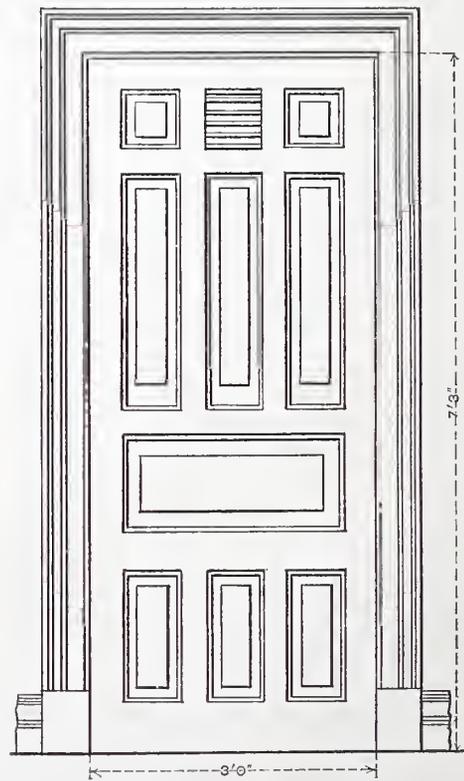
Second Story Door.—Scale, 1/2 Inch to the Foot.
